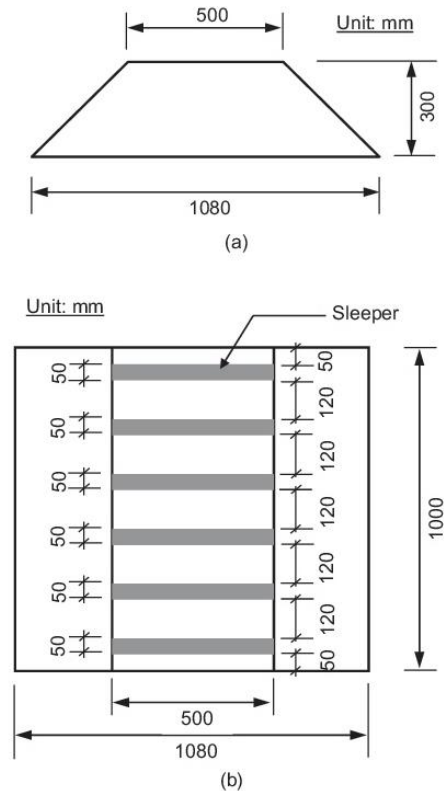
Straight embankment: (a) cross section; (b) plan view.
